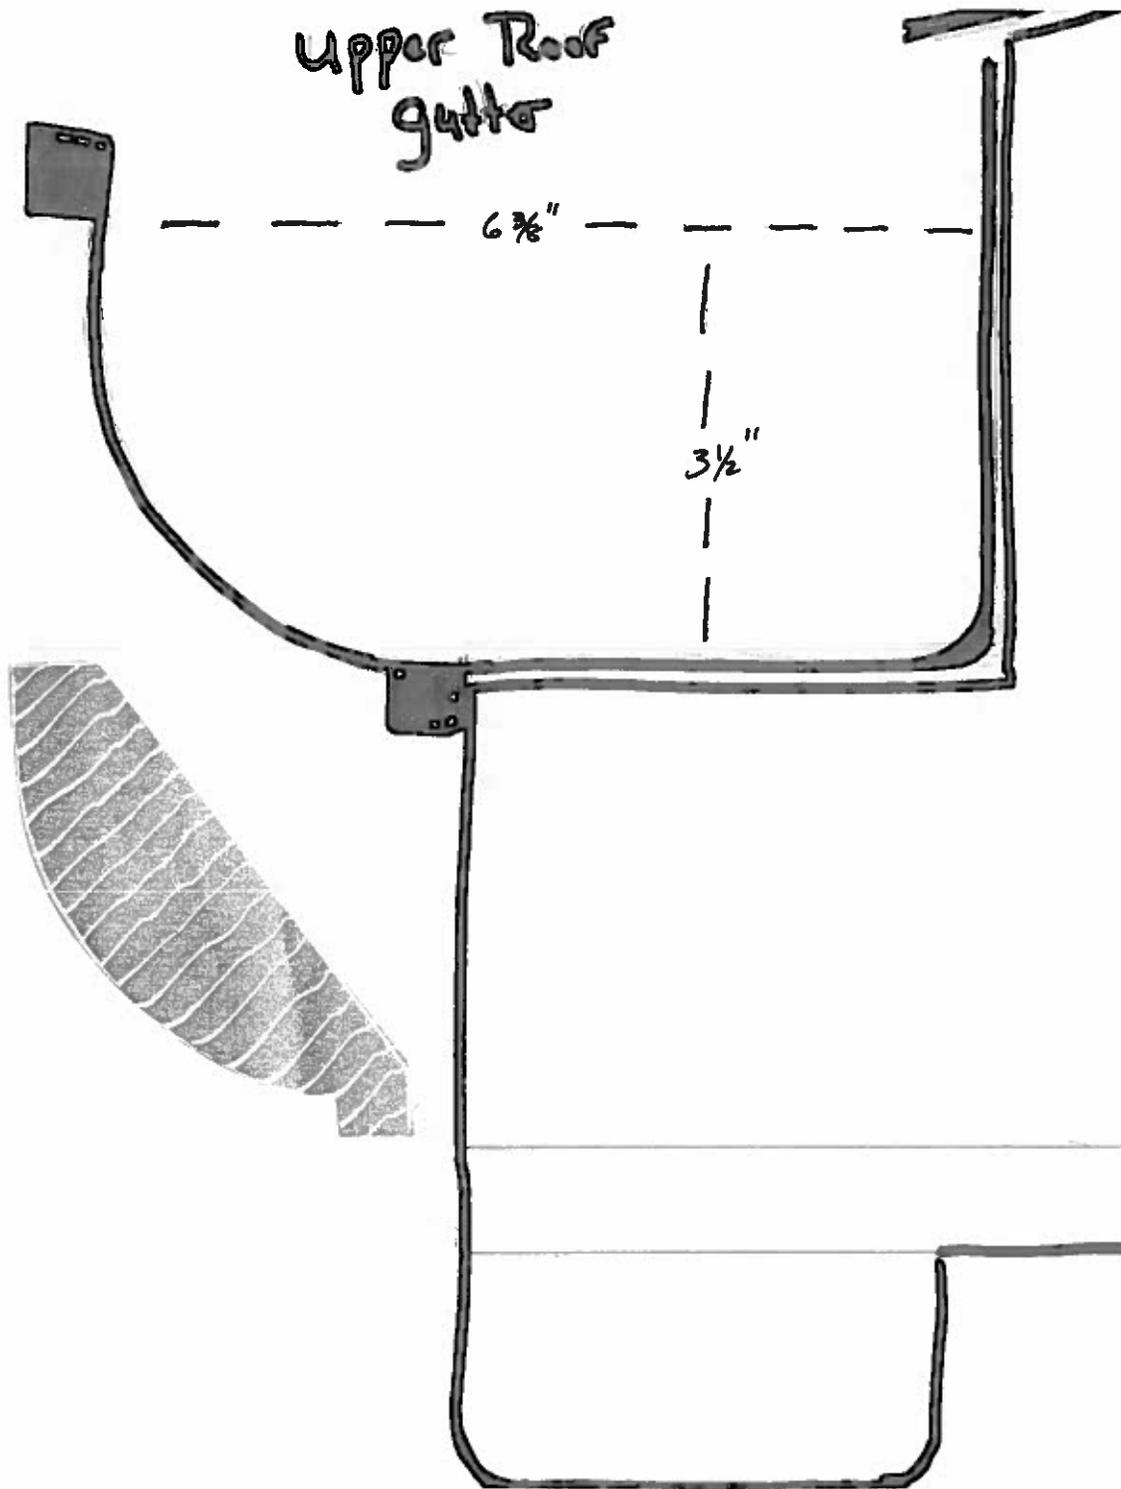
Proposed main roof fiberglass gutter design with the original profile alongside
